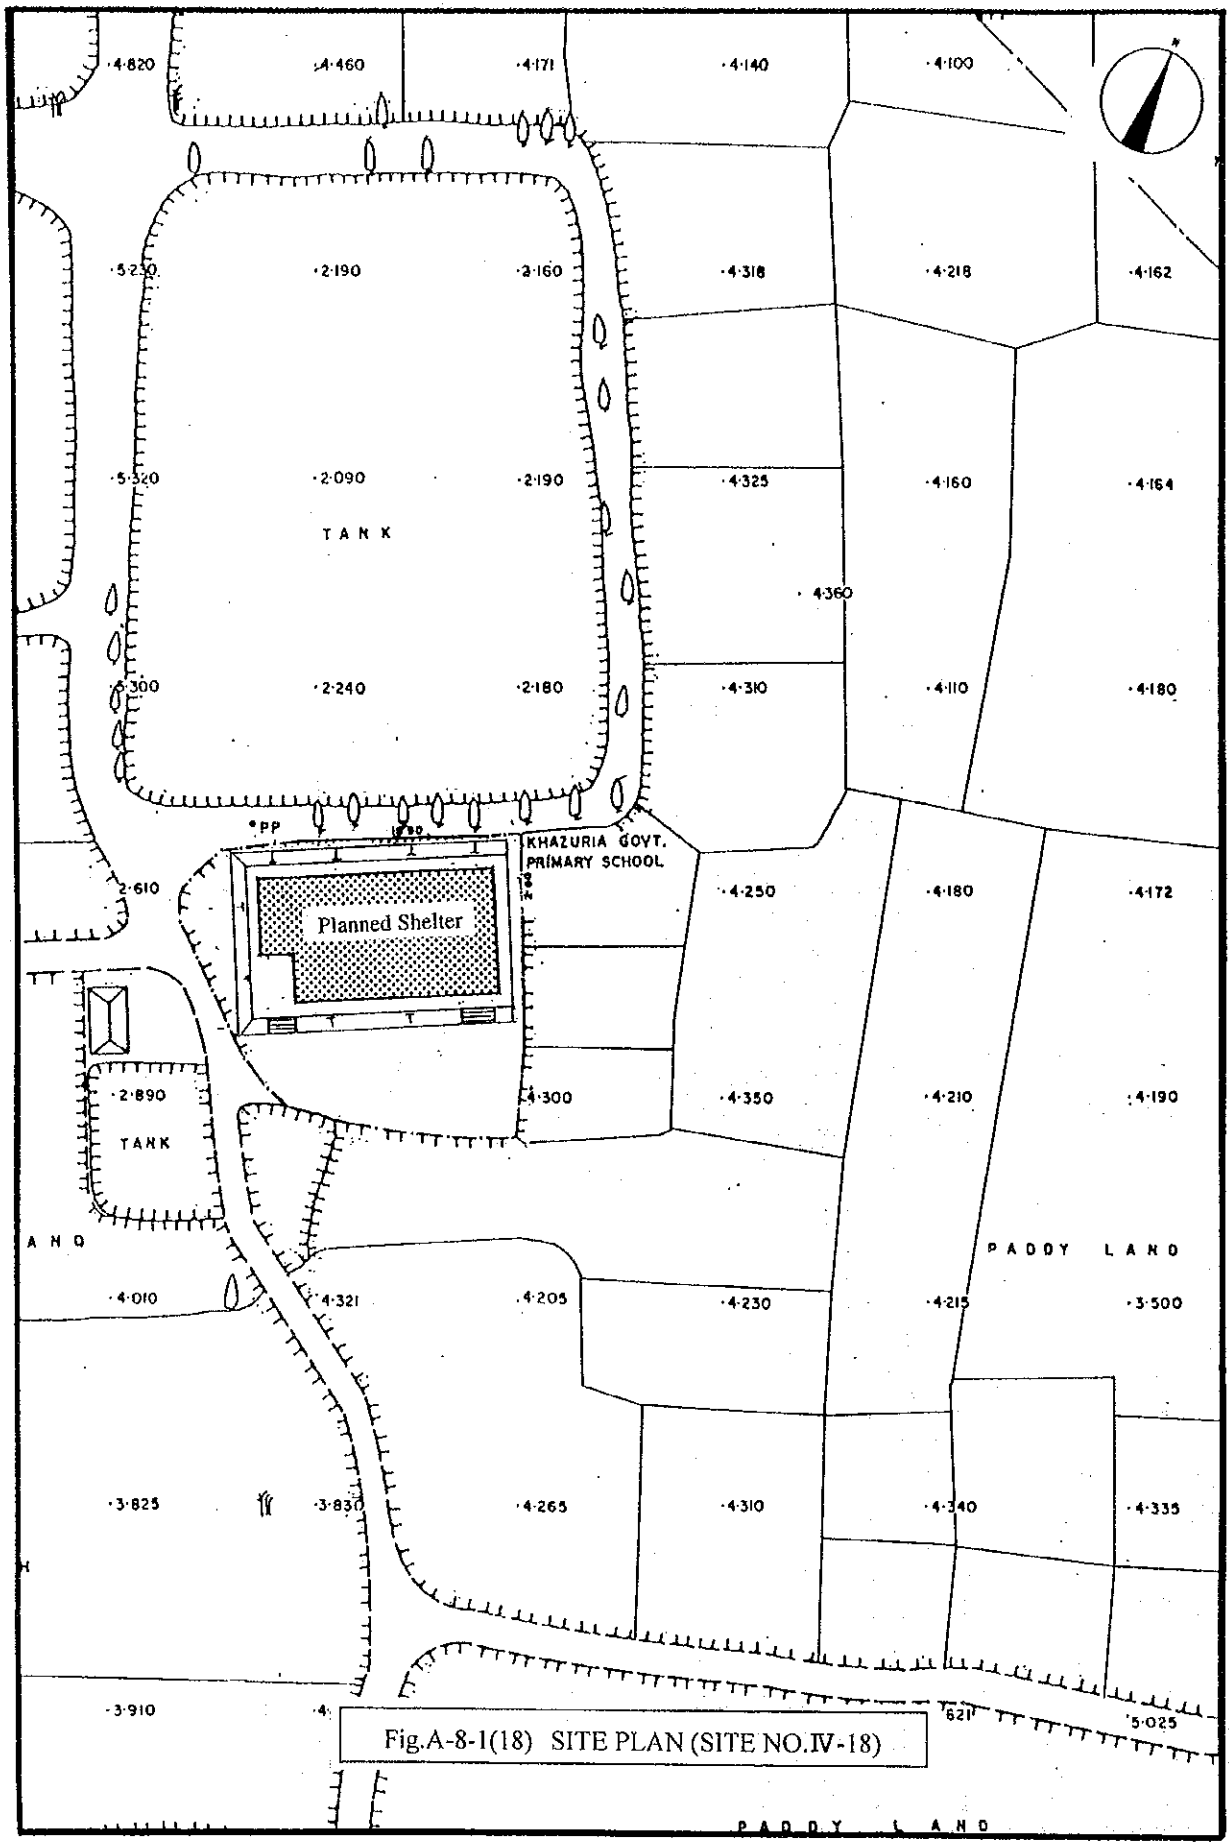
(18) SITE PLAN (SITE NO.IV-18)
